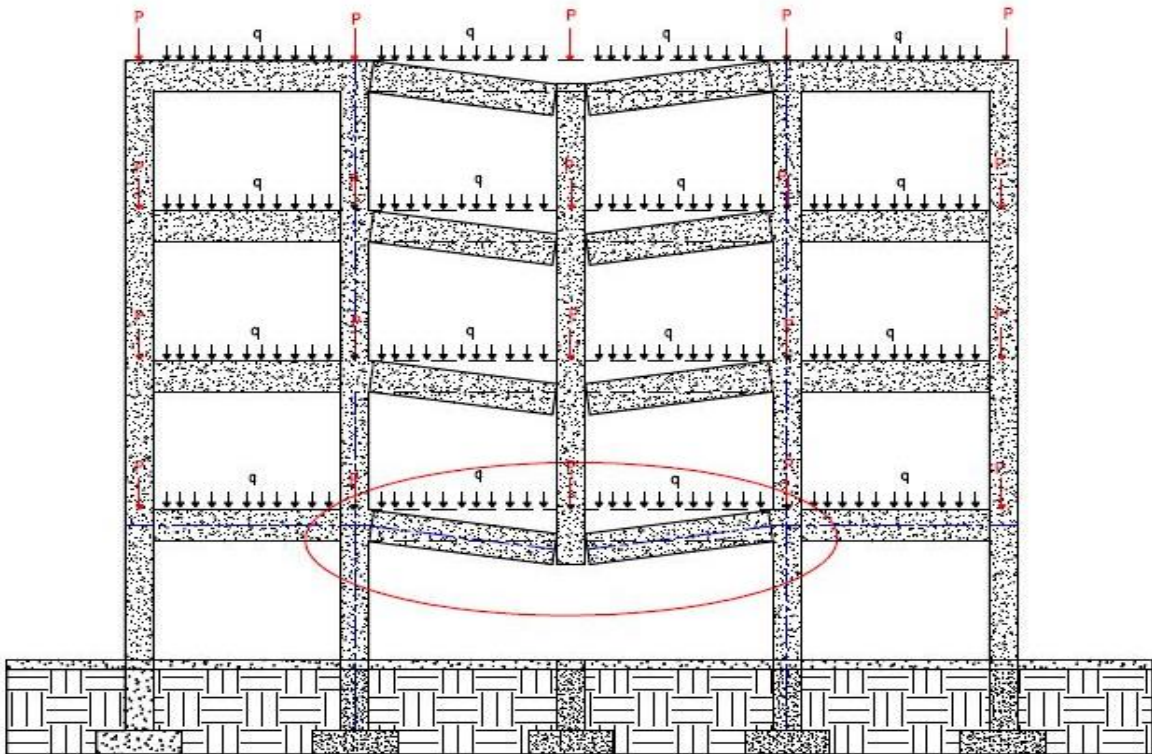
Typical 2-D Concrete Building Frame with a Lost Column
